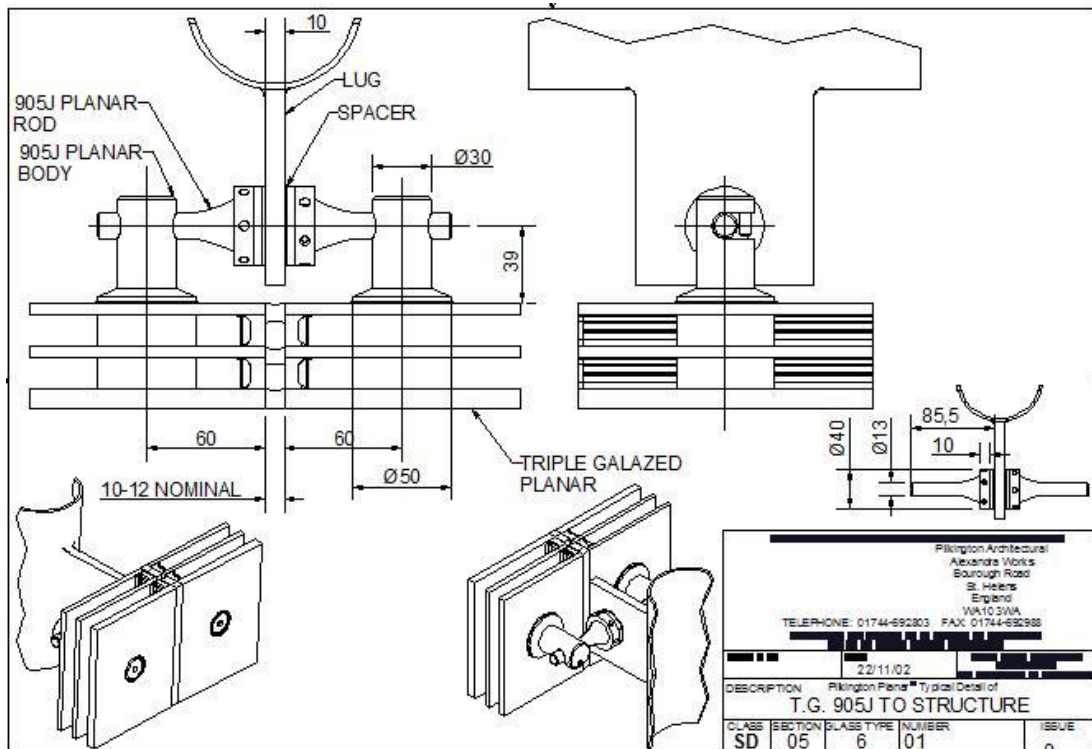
2-Point Connector to Glass Fin and Steel Tube on Triple Glazed Glass Curtain Wall (Pilkington, 2009)
